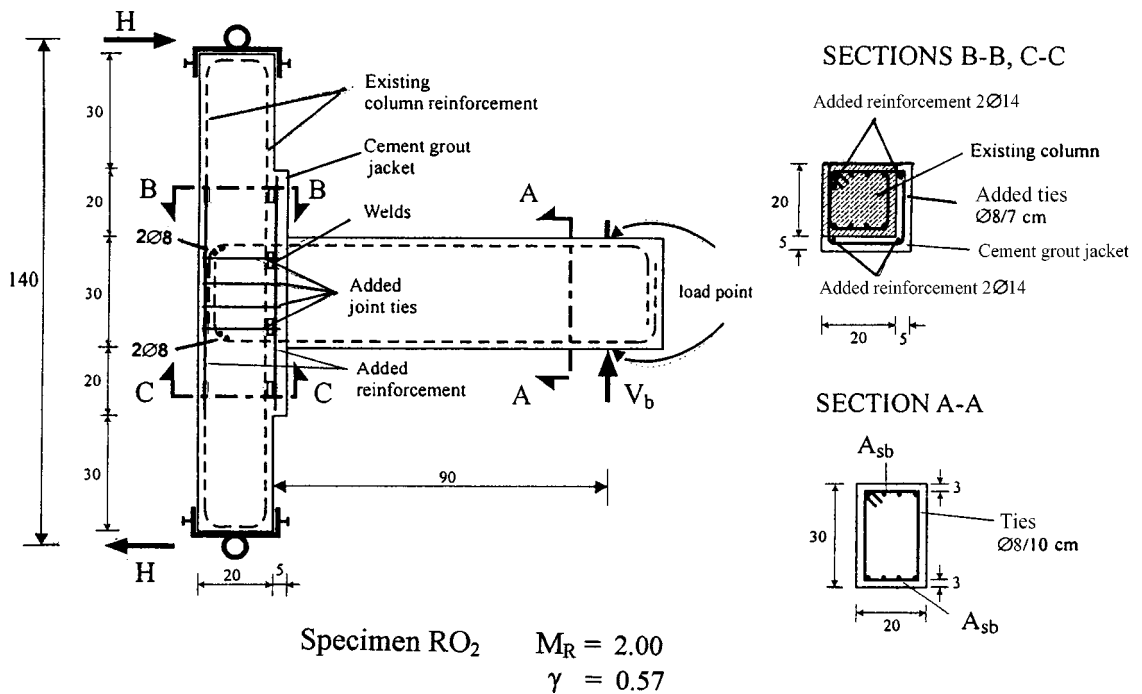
Jacketing of beam-column connection of subassemblage RO₂ (dimensions in cm)
